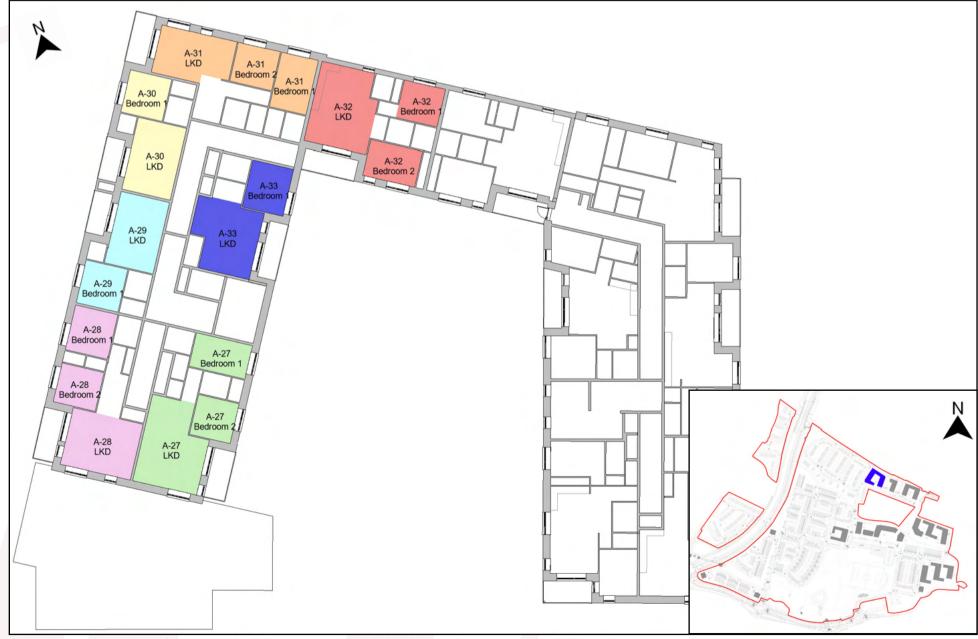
Floor plan of assessed building & Keyplan highlighting the assessed building.
